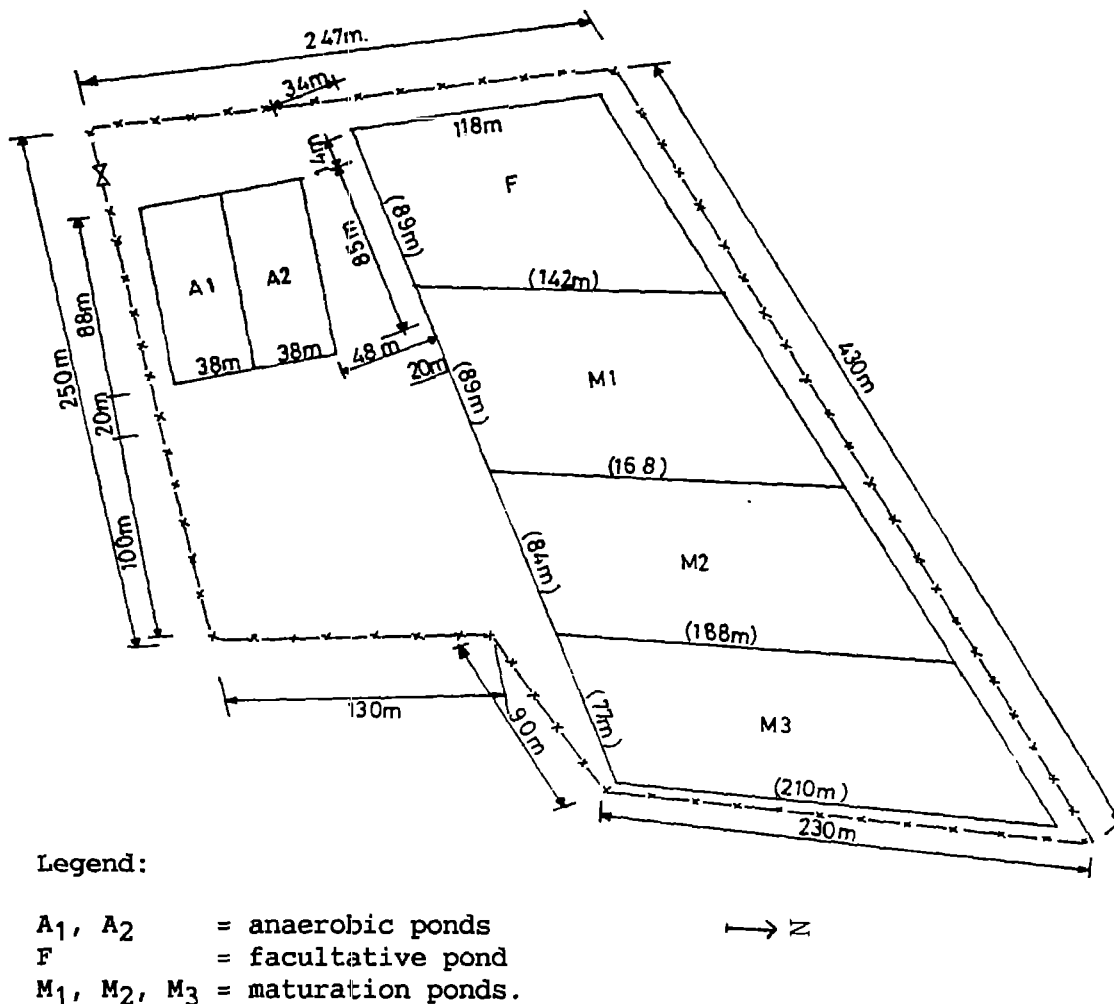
Layout plan of Vingunguti waste stabilization ponds (Howard Humphreys 1988).
